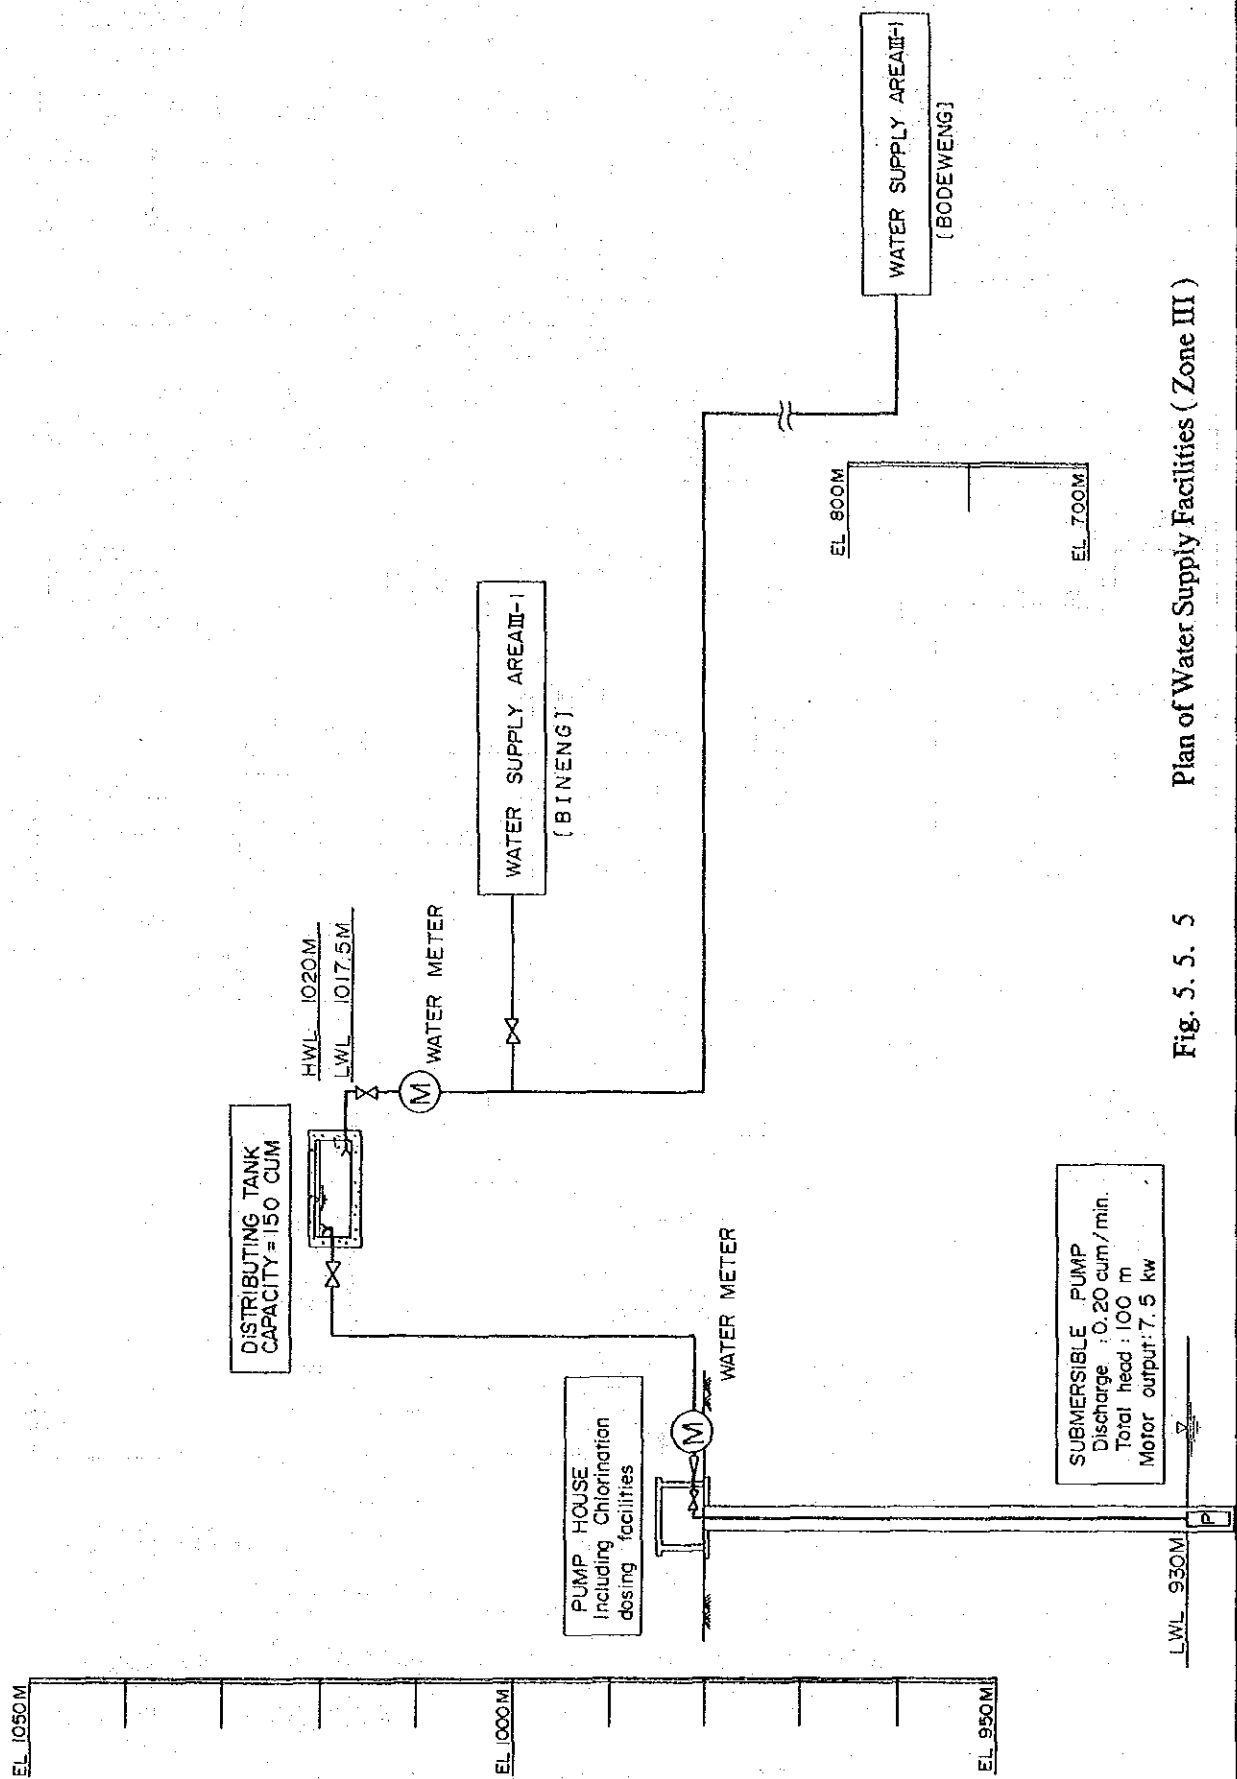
5. 5 Plan of Water Supply Facilities ( Zone III )
